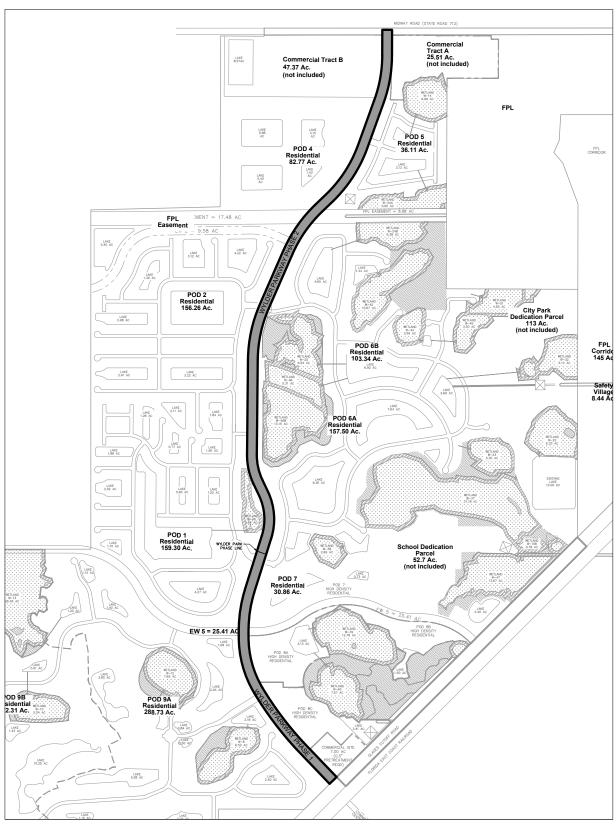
SITE PLAN LTC RANCH - EW-5
